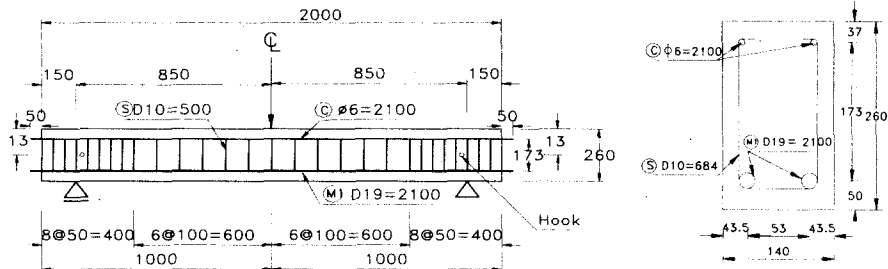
Detail of beam specimens (A1, A2, A3, C1, C2, C3)
